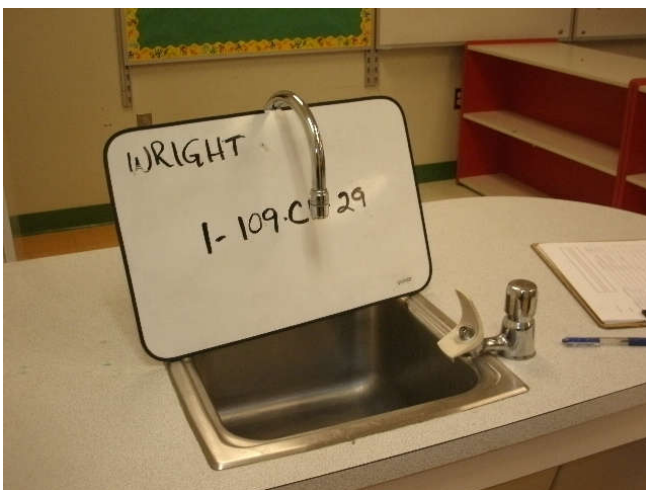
Classroom faucet w/bubbler, located on the 1st floor, in room 109.
